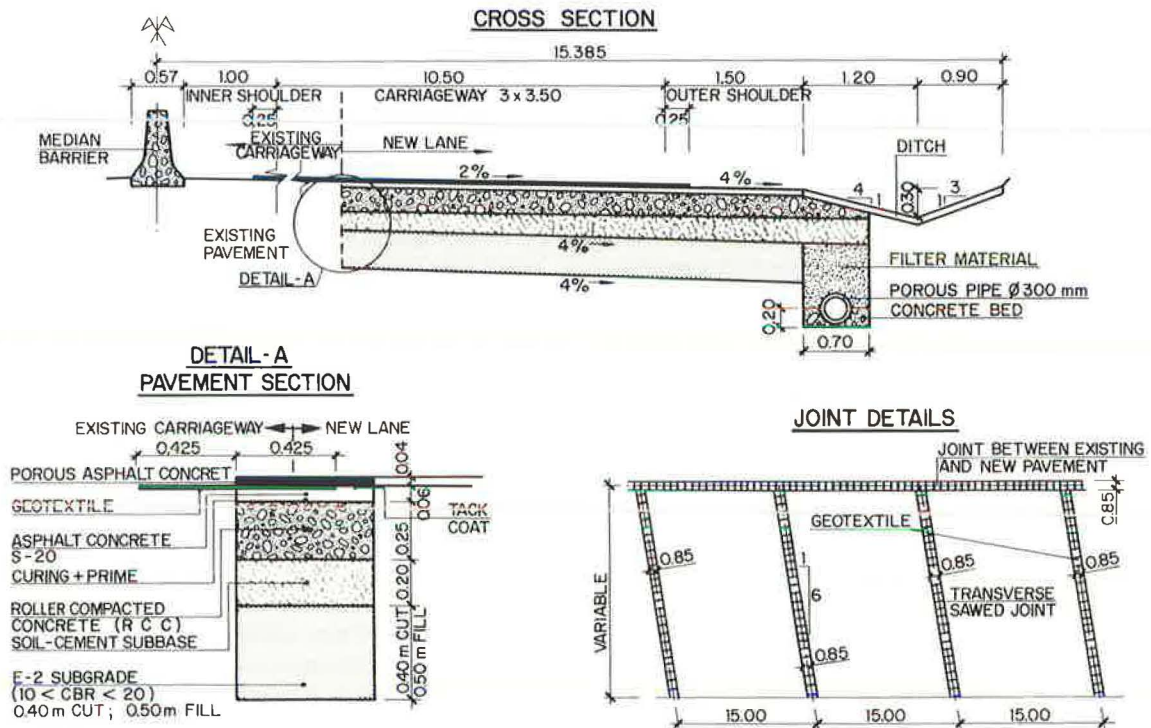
Use of rolled compacted concrete in dual-carriageway roads; addition of a new lane to the existing carriageways (National Road IV, Villaverde-Seseña section, 1987).
